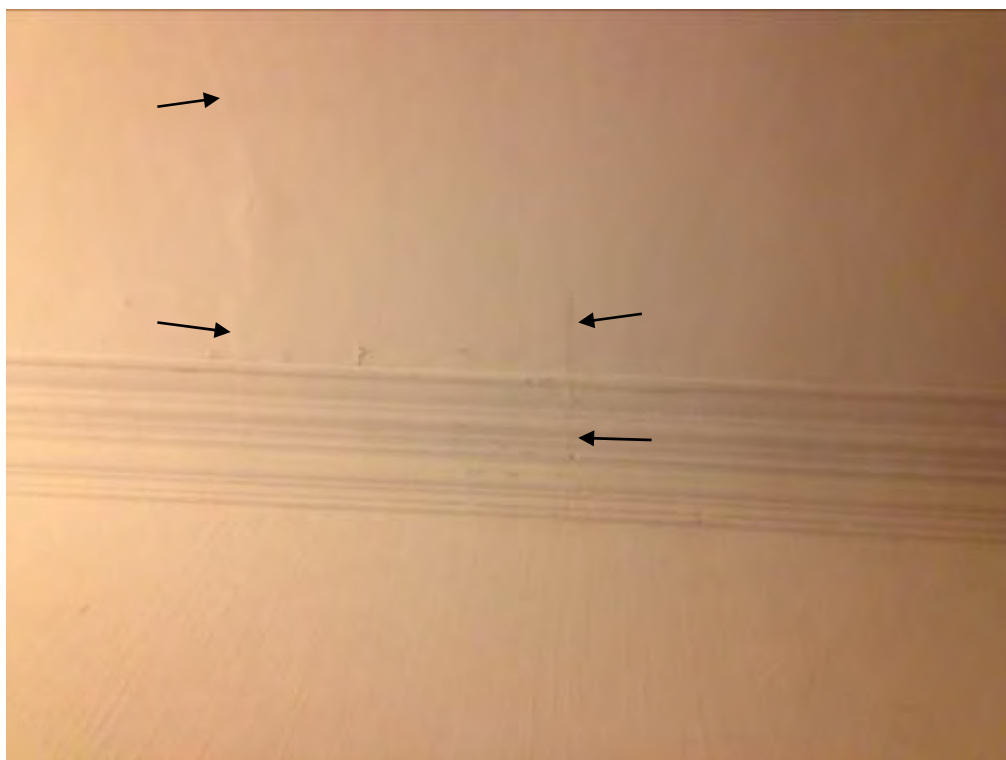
shows a hairline radial crack extending from the right hand side of Bedroom 1 door head towards the cornice
